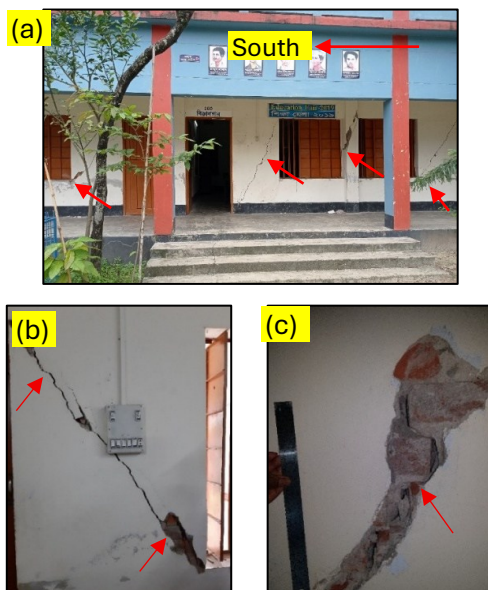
, A series of diagonal cracks at the outside view (a) and close inside views of diagonal cracks (b) and (c) of the damaged building (Badar Uddin Ahmed Kamran building of Raja GC high school), Bandar Bazar, Sylhet.
